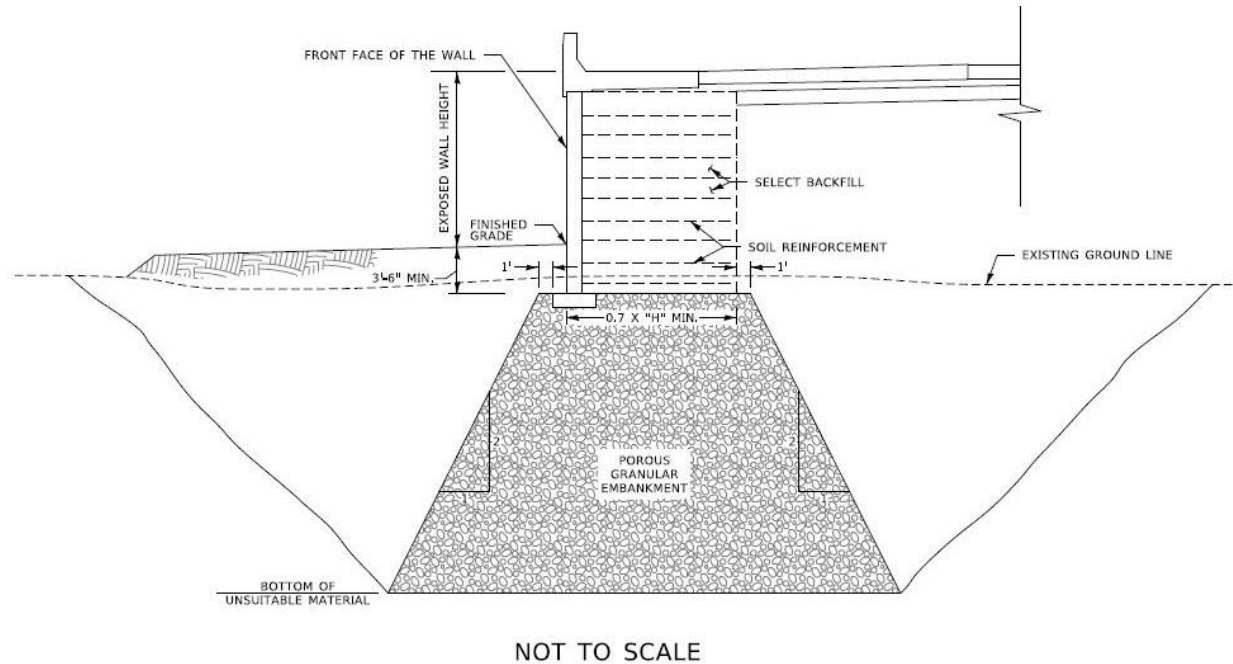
Structural Fill Placement below MSE Wall Footing
